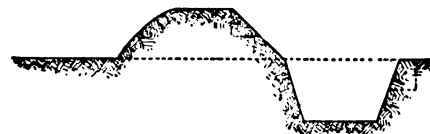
CROSS-SECTION OF STANDING TRENCH.
